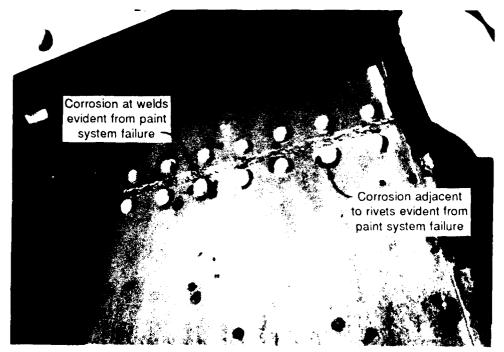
Tainter gate at Mississippi Lock and Dam No. 5 with seal weld and localized corrosion
